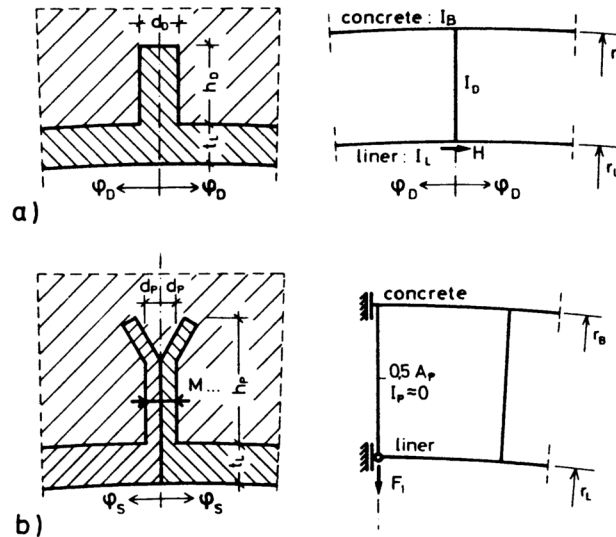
Simulation of liners with a) shear anchorage b) tension anchorage
